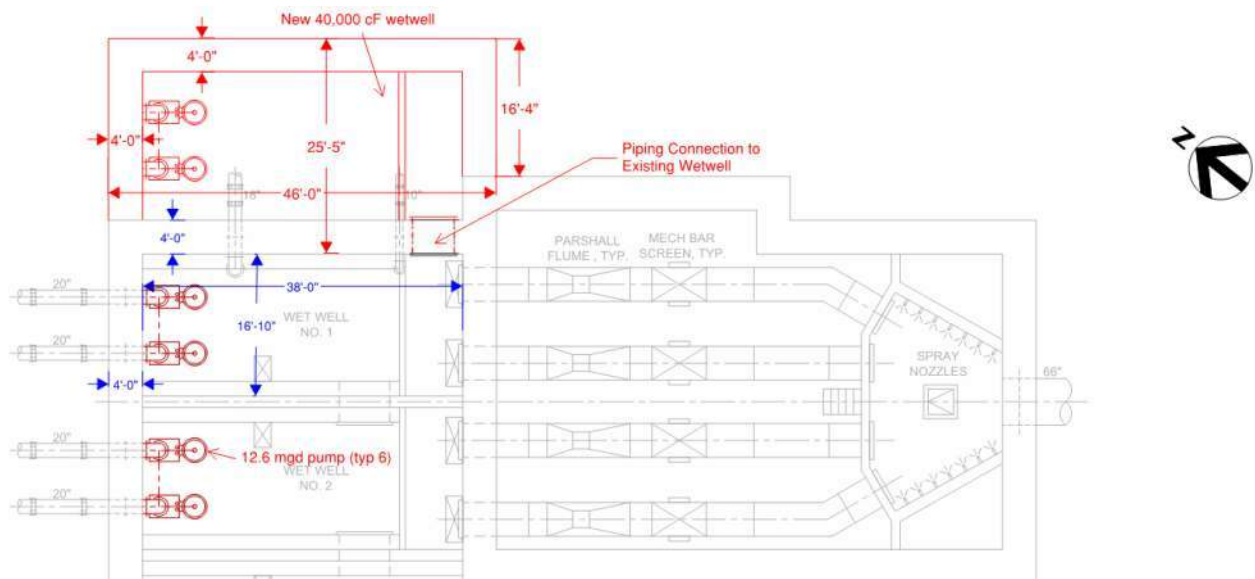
Recommended MCR WWTP Expansion IPS Pumping Improvements
